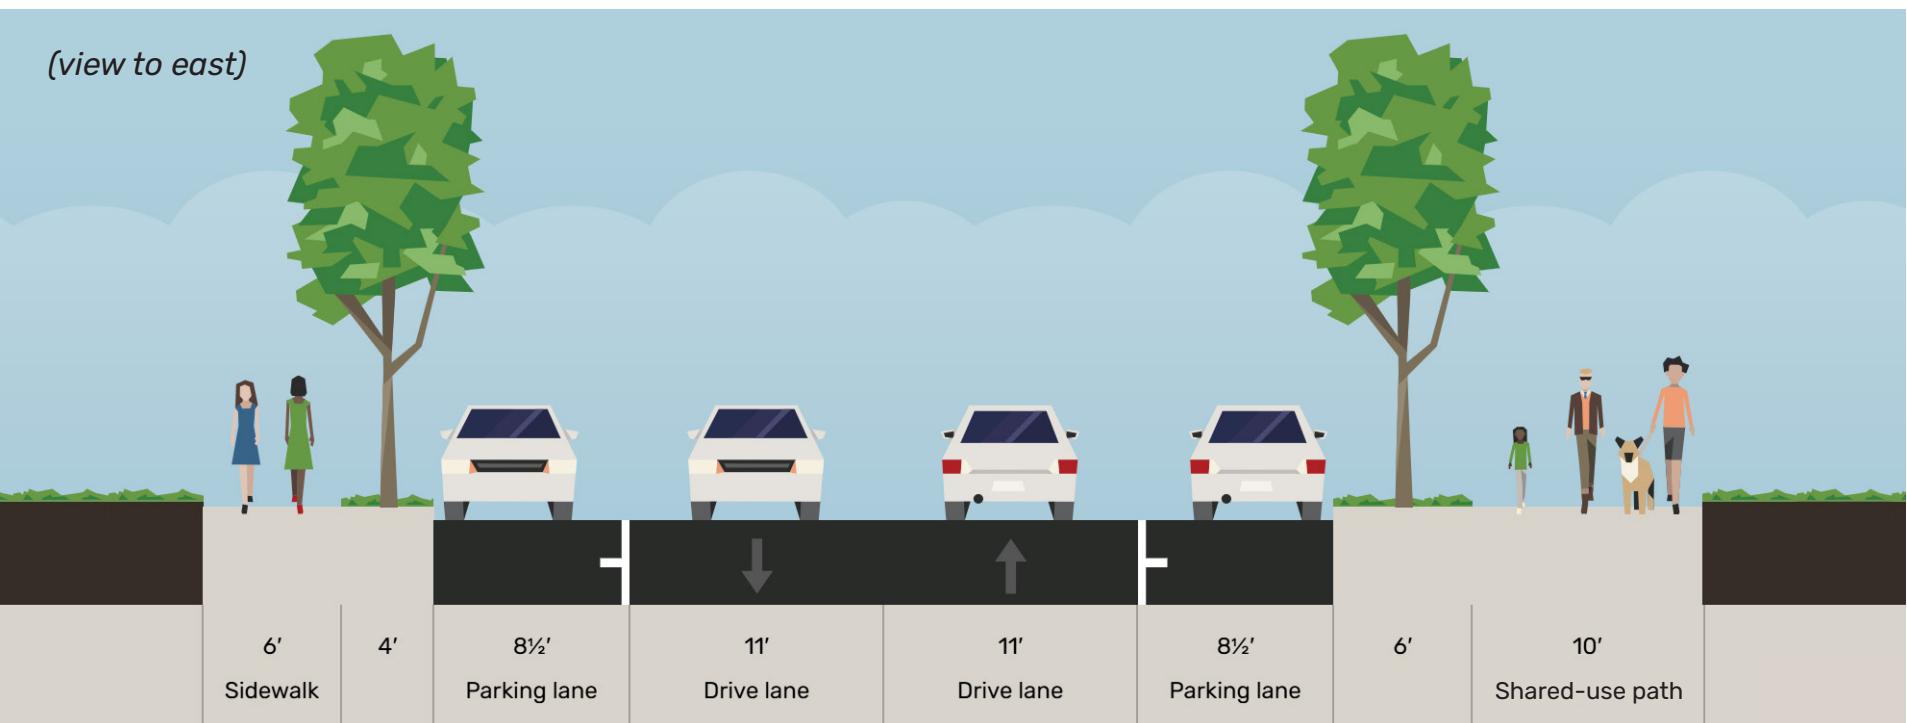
Proposed Typical Cross-Section on Creekside Drive (65’ ROW)
